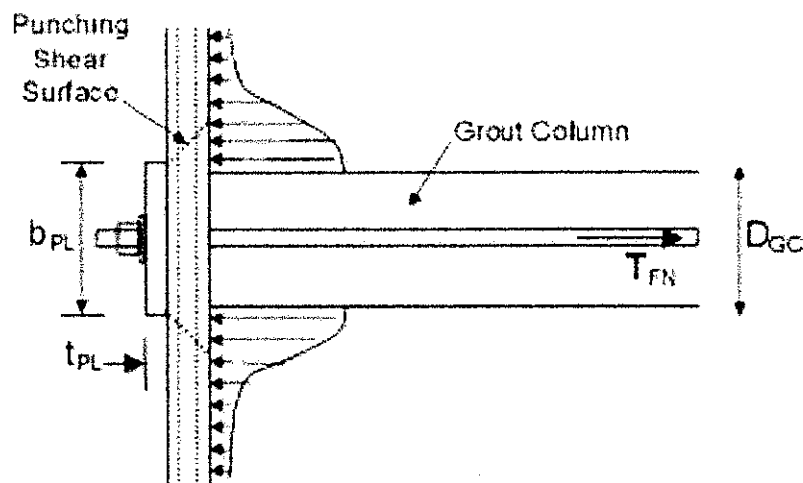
Typical Punching Shear of Bearing Plate Connection (from Liew 2005)
